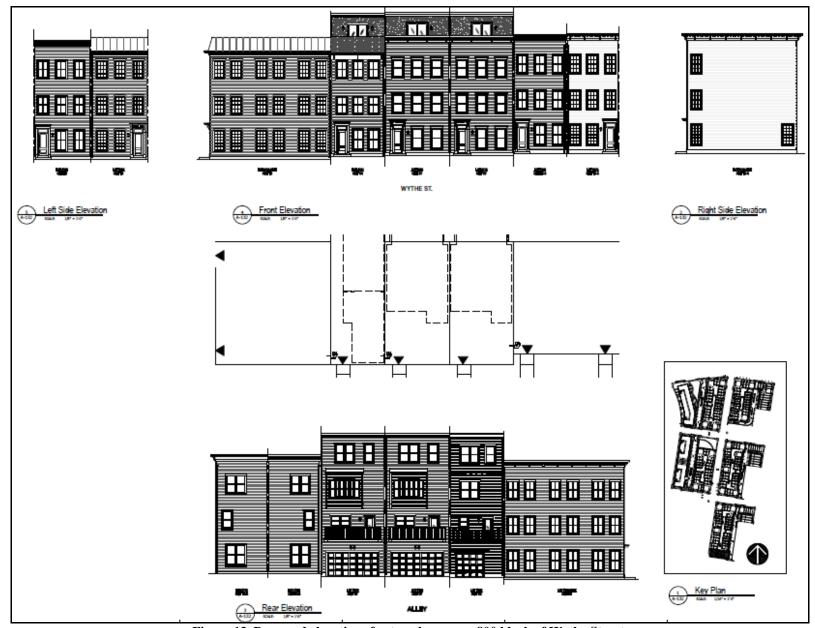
Proposed elevations for townhouses on 800 block of Wythe Street.
